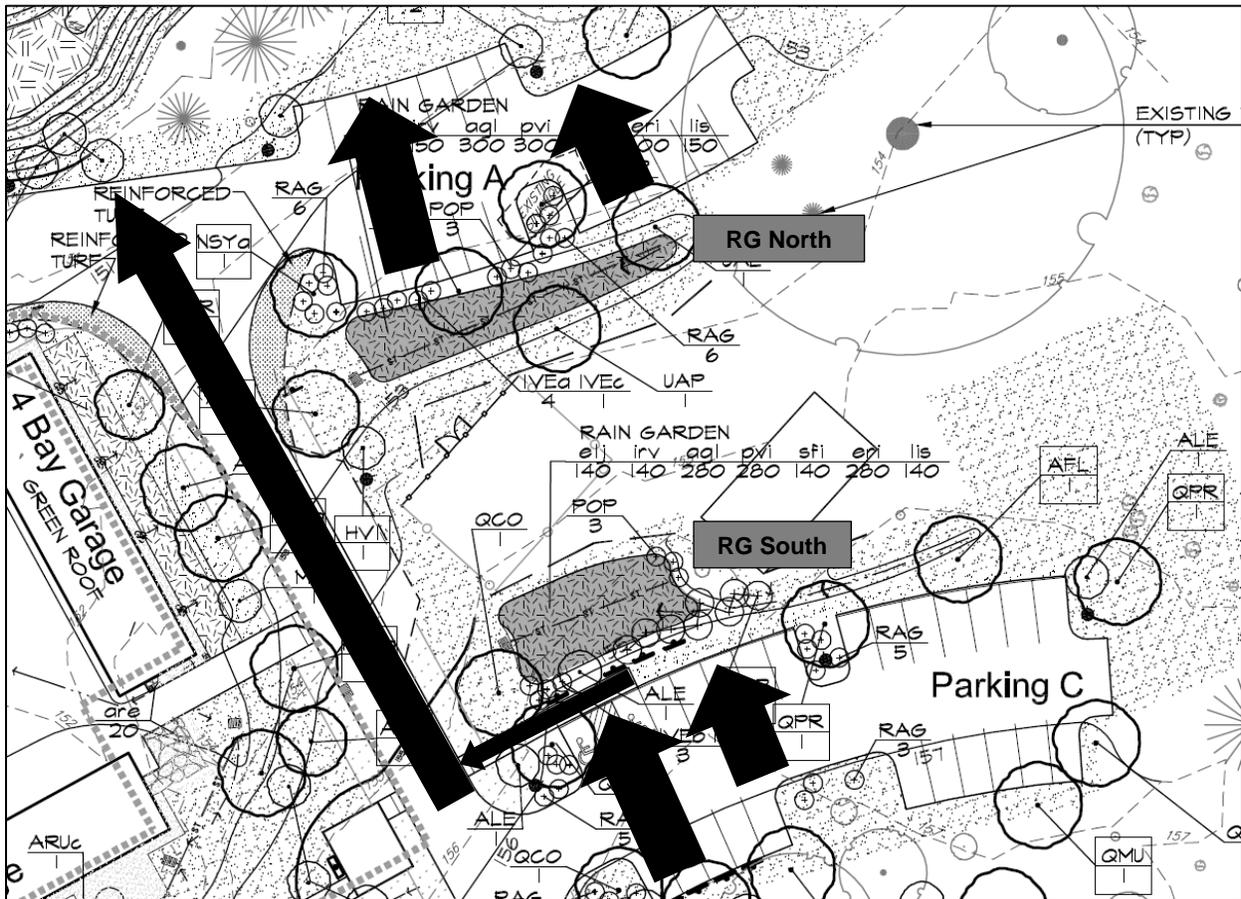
Detail of rain garden location from as-built plans from Andropogon Associates Ltd. (2008). Rain Gardens North and South are highlighted in green. Blue arrows indicate stormwater flow direction.
